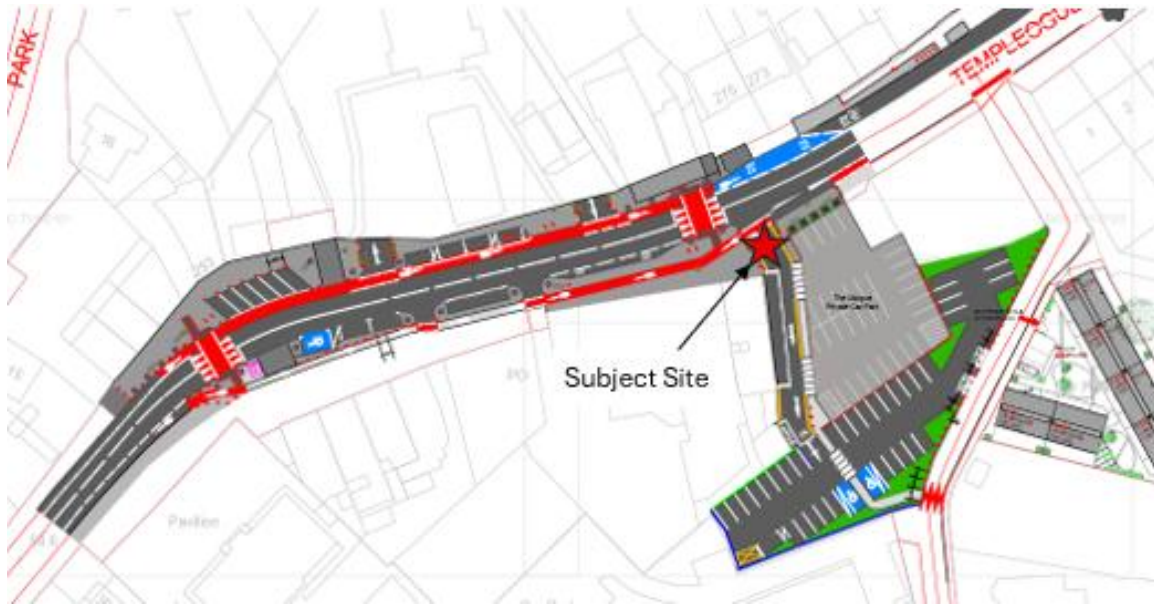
SD188/0001 Site Layout Plan (Source: SDCC)
